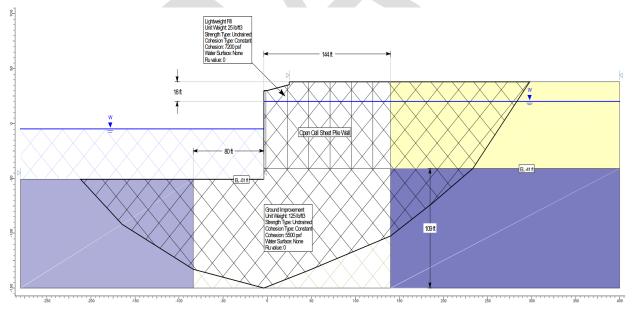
Ground Improvement Below Existing Sheet Pile Wall
